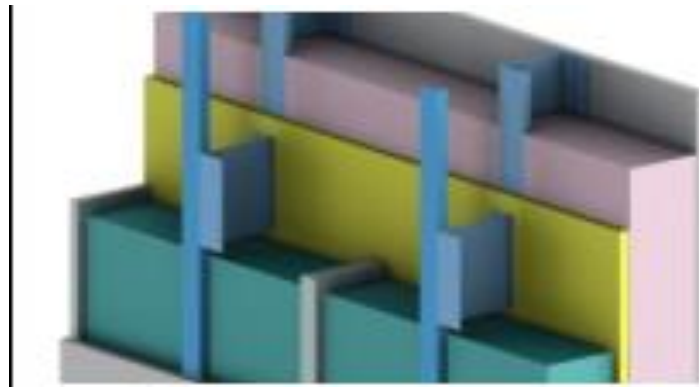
Detail construction of a wall assembly ([extensive guide](#))
